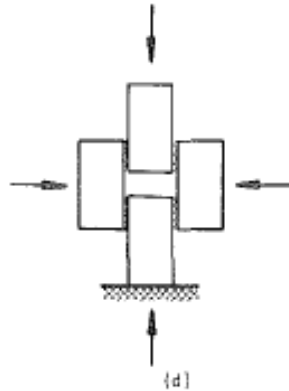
Masonry Prism Configuration for Testing of Bond and Bed Joints (Atkinson, et al. 1989)
